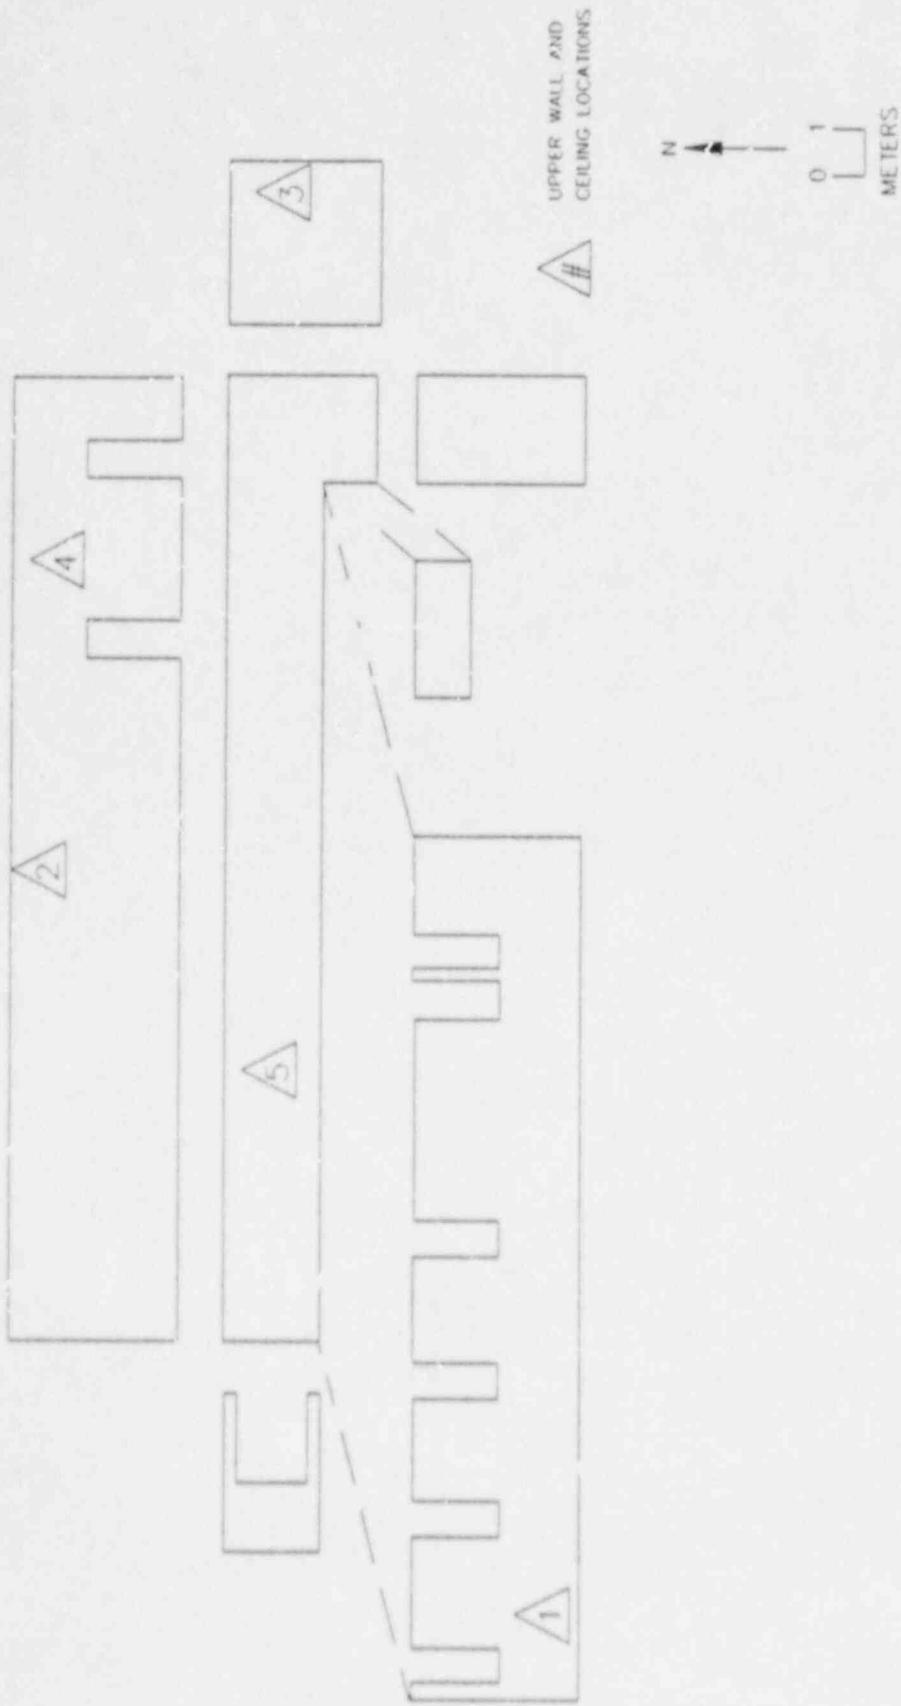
Hallway (Area 55) Showing Locations of Upper Wall and Ceiling Single-point Measurements
